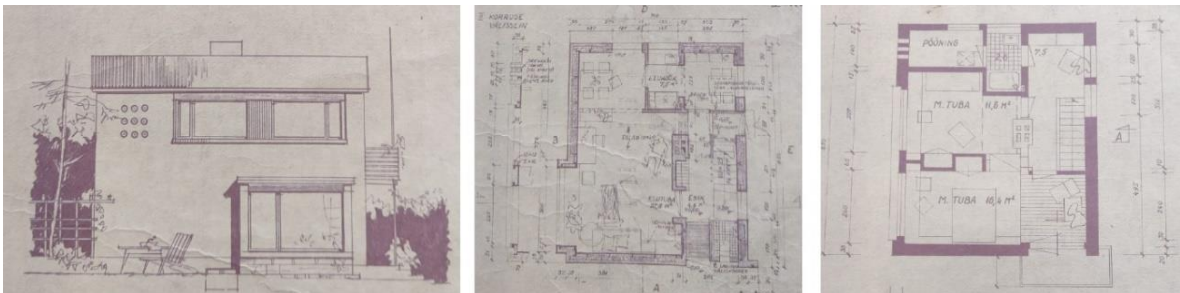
Project 66, example of a box house design from 1965 (left to right: elevation; ground floor; upper floor) (RPI Estonprojekt, 1965)
